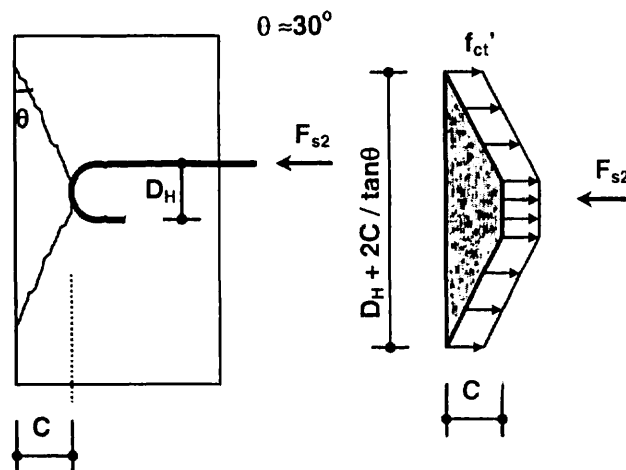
Cone splitting failure of the cover in front of a hooked anchorage without stirrups
